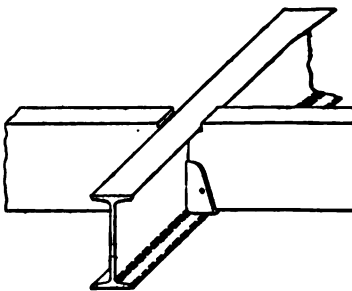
Wooden Beam Framed to I Beam with Duplex Hanger
